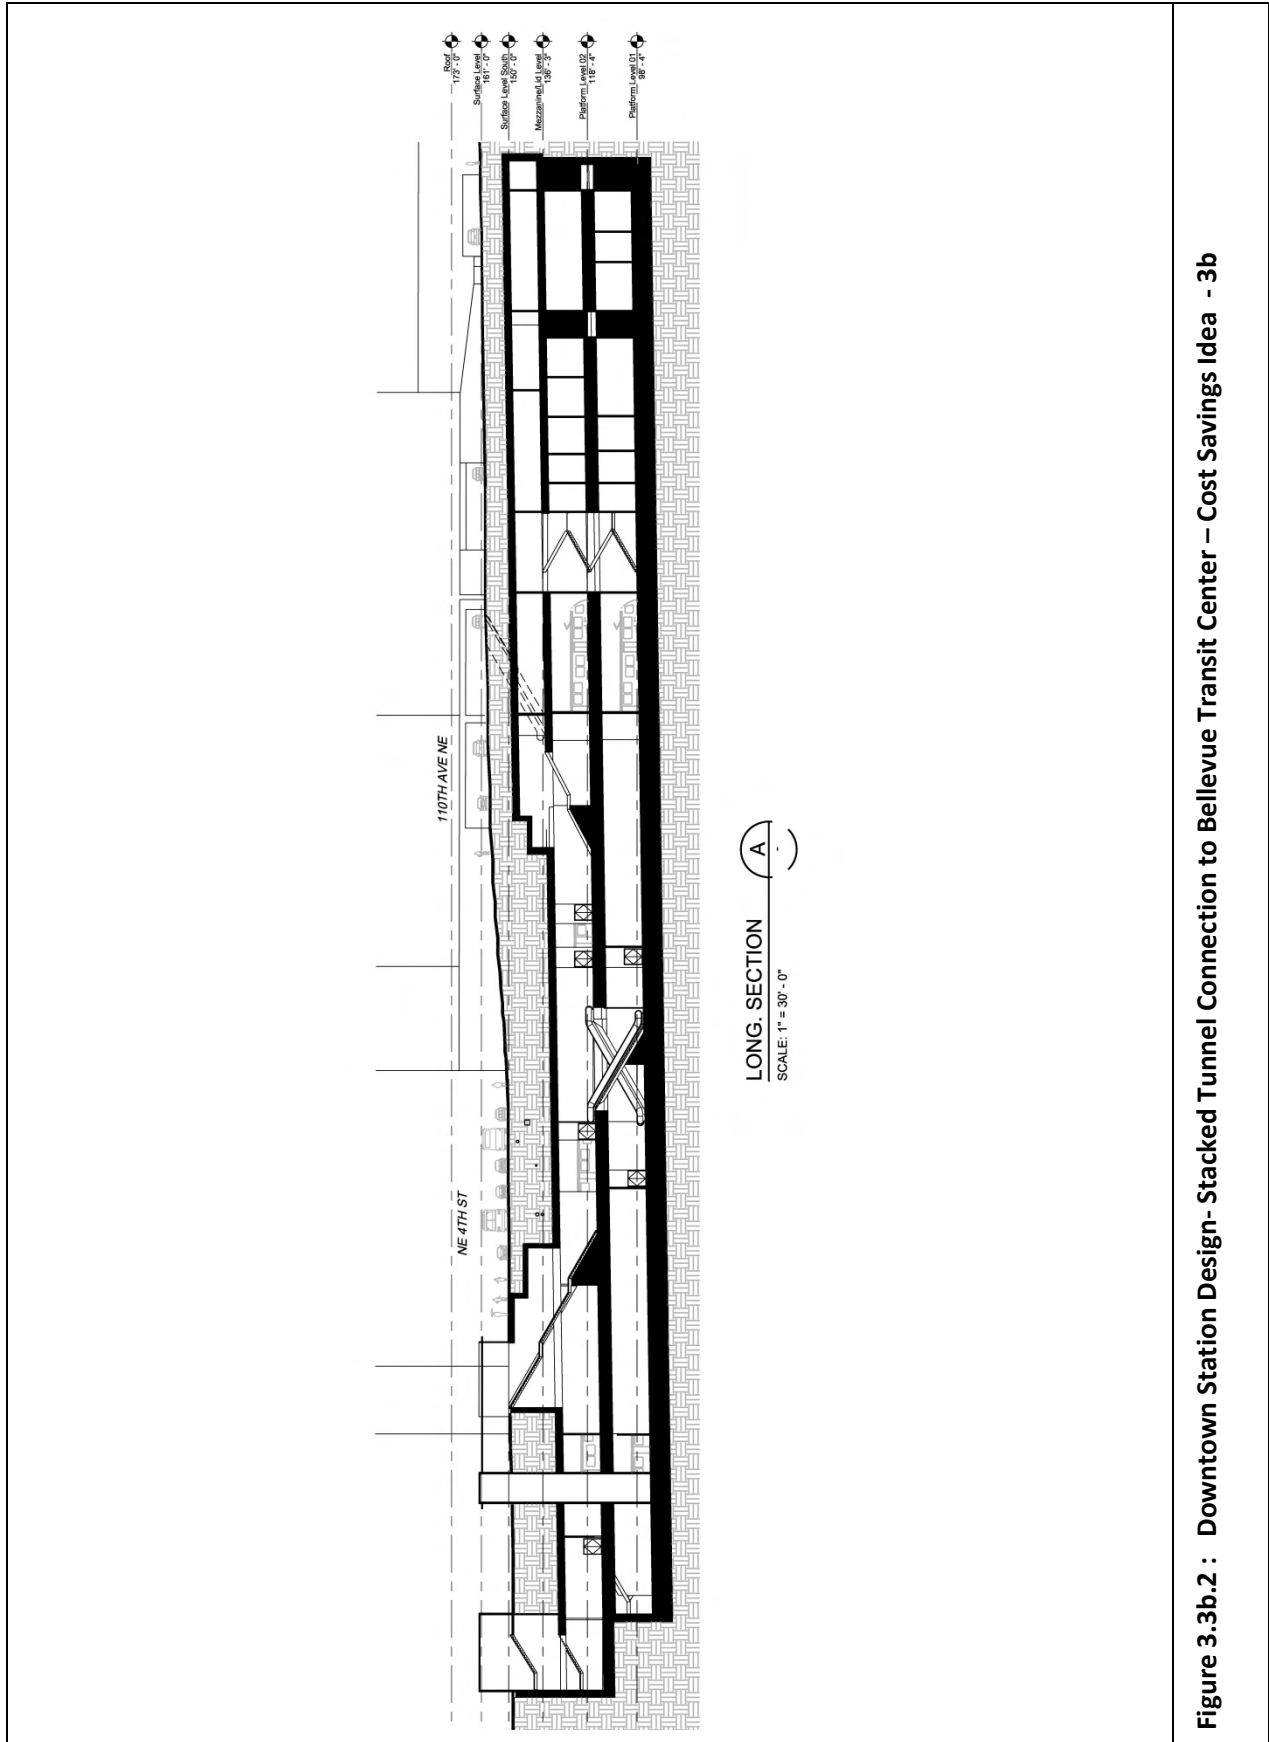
2 : Downtown Station Design- Stacked Tunnel Connection to Bellevue Transit Center – Cost Savings Idea - 3b
